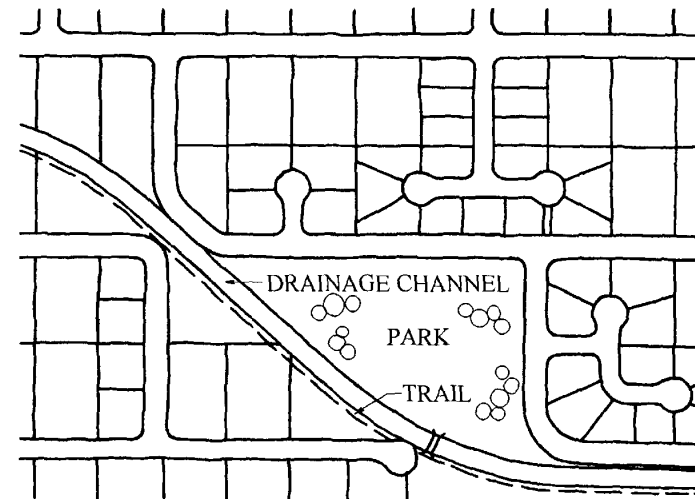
Potential Local Street Configuration with Park, Drainageway
